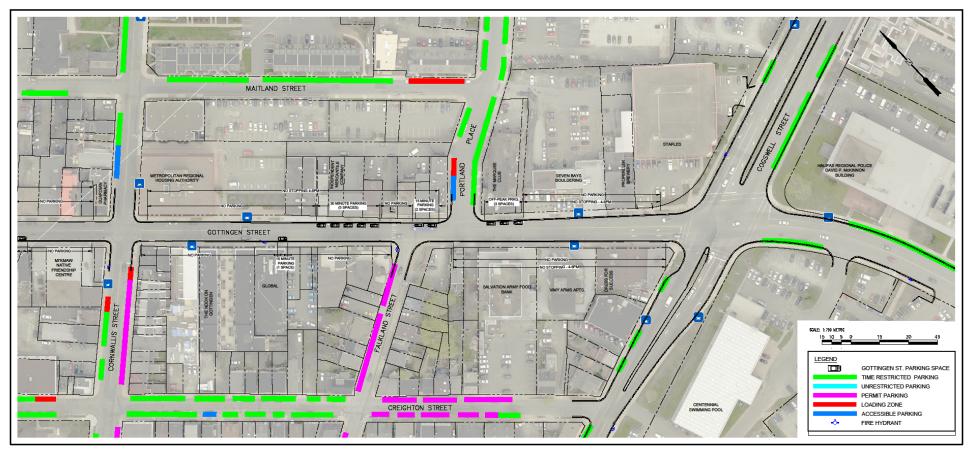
Existing Conditions – Cornwallis Street to Cogswell Street
